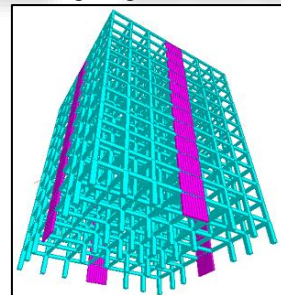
Floating column at 1st intermediate position of columns and shear wall at 4 sides of the building
